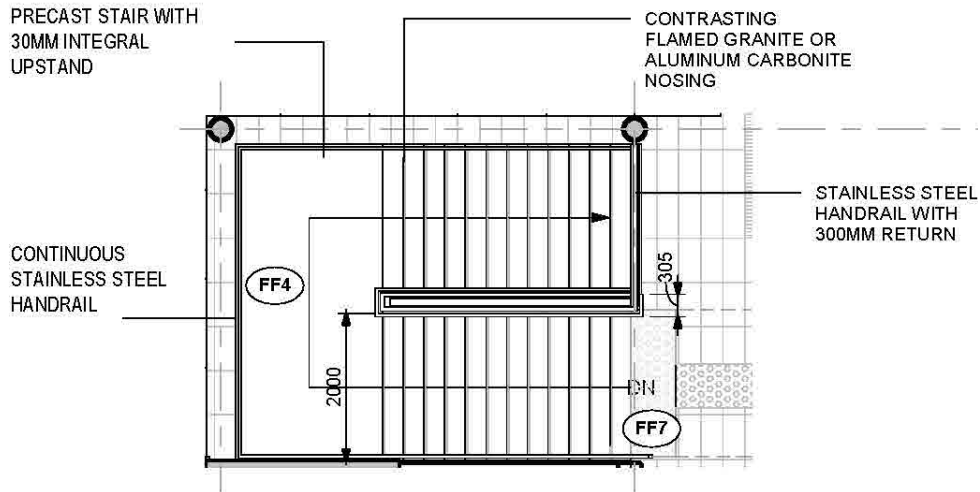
Illustration of a precast stair in Platform Access Module with tunnel access
